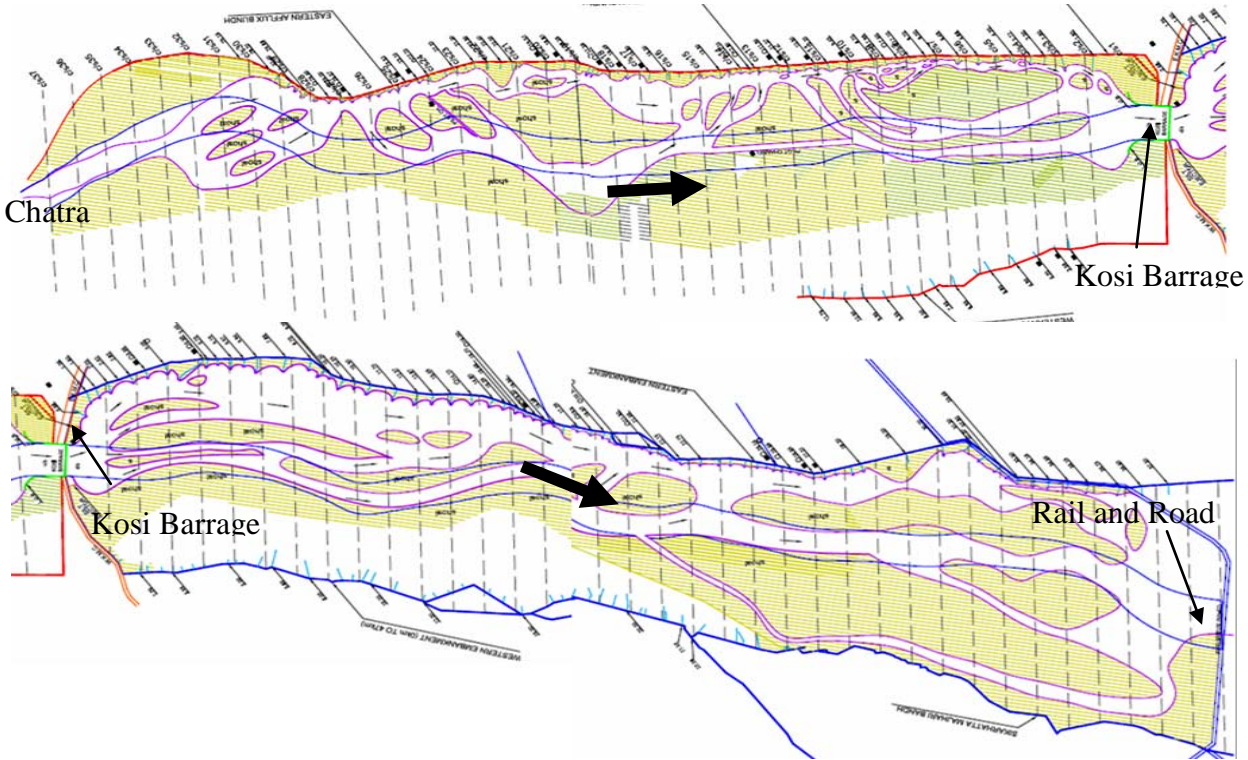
Plan showing layout of embankment for a reach from Chatra to rail-cum-road bridge (Waterway = 1,100 m)
